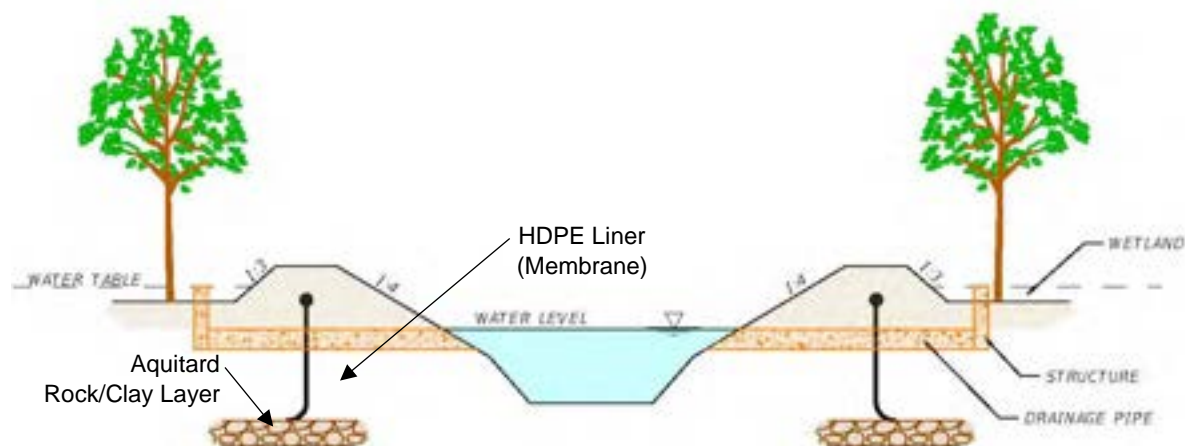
Example of a seepage barrier concept to avoid water table drawdown in surrounding wetland areas.
